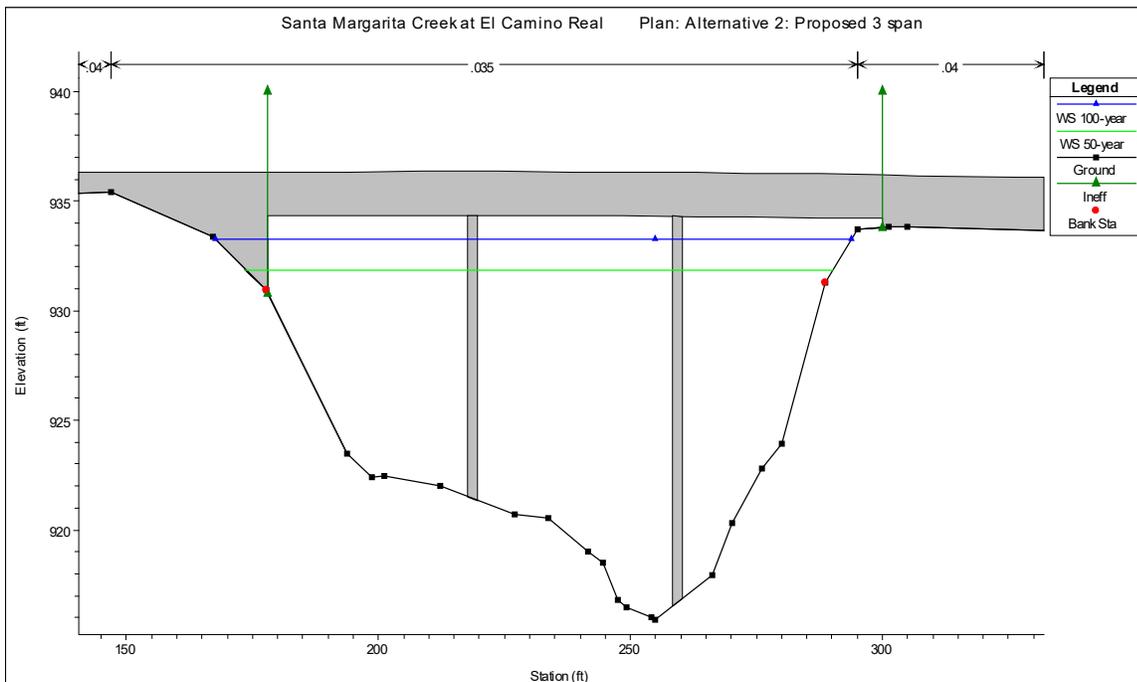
Alternative 2 – 122 ft, 3-span Bridge
